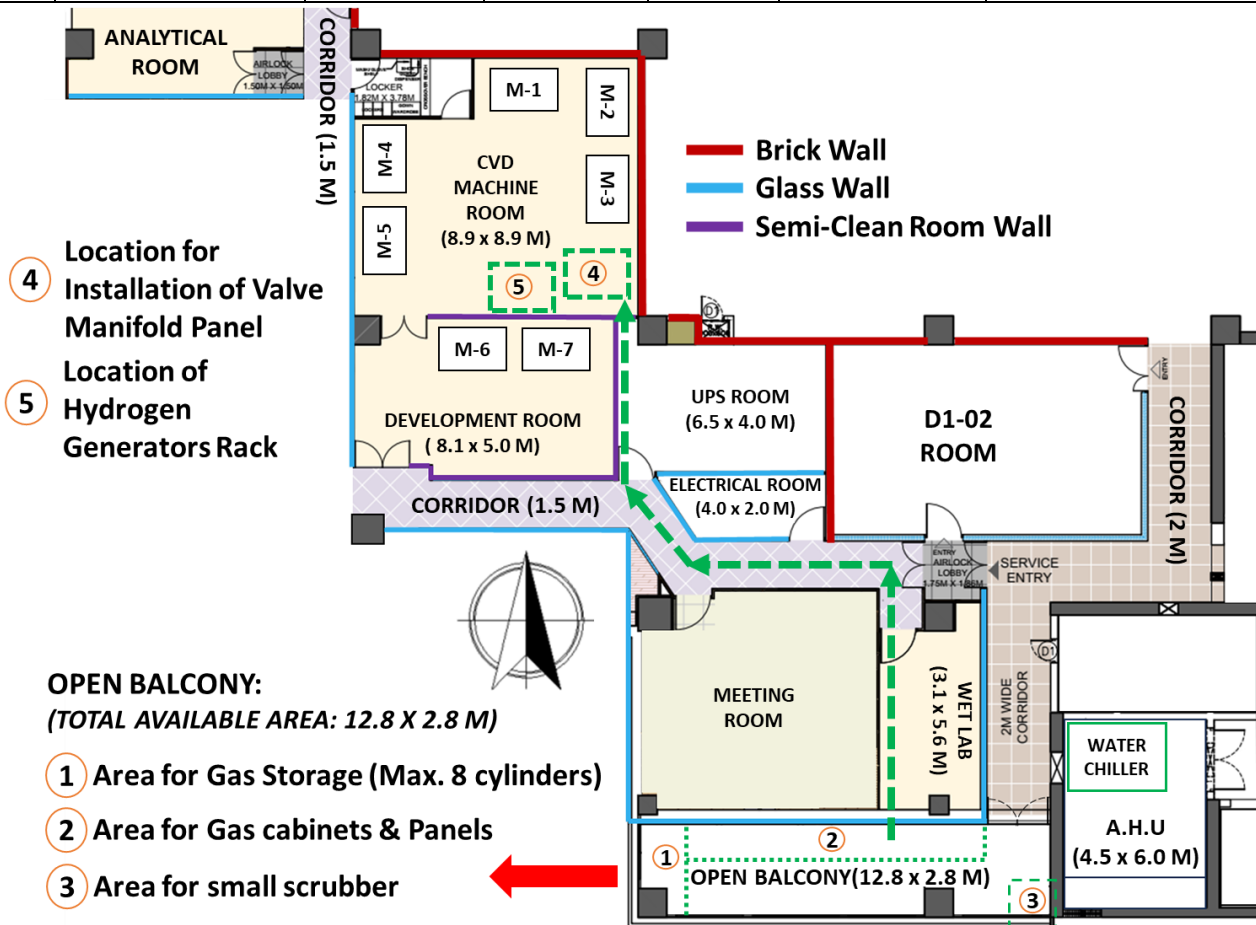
Floor plan details with preferable pathway (green arrow) for gas line construction
